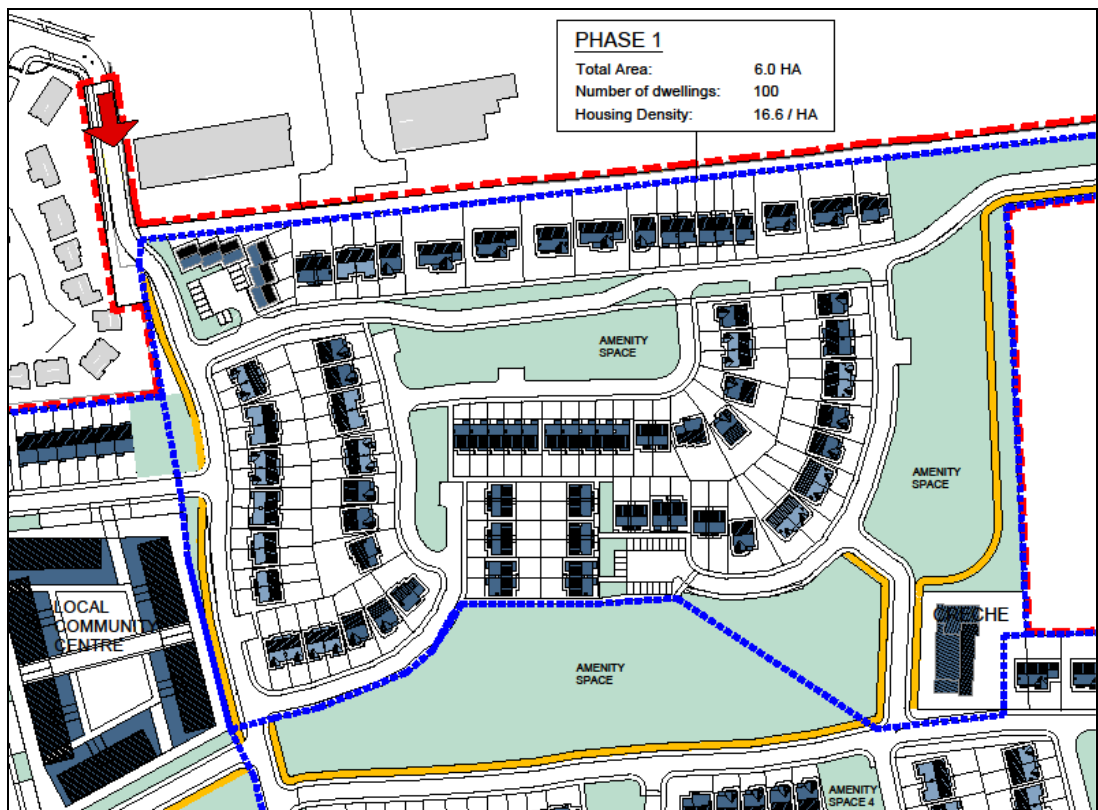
Proposed Site Layout for Subject Site - February 2021
